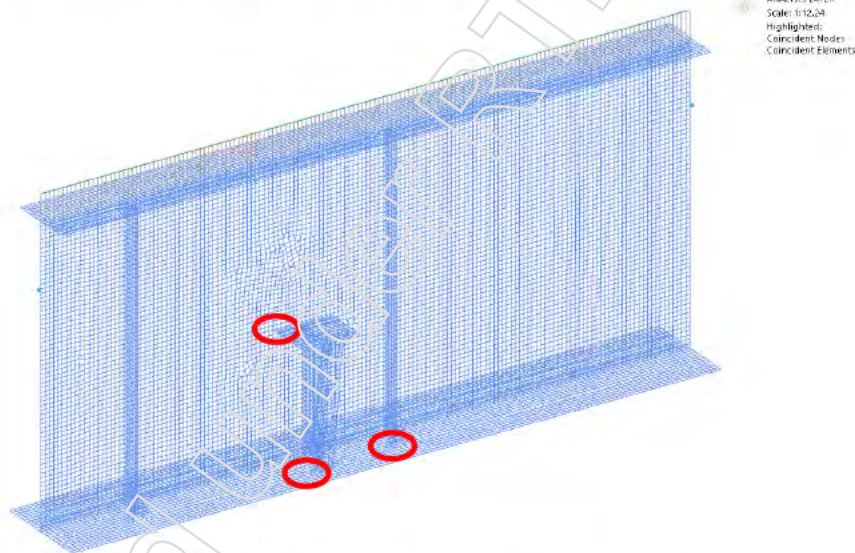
Cross girder and stiffener model with critical sections highlighted.
